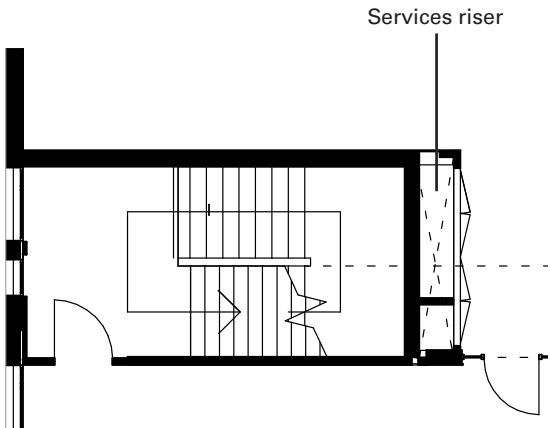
Consented Level 07 Plan - Detail View
